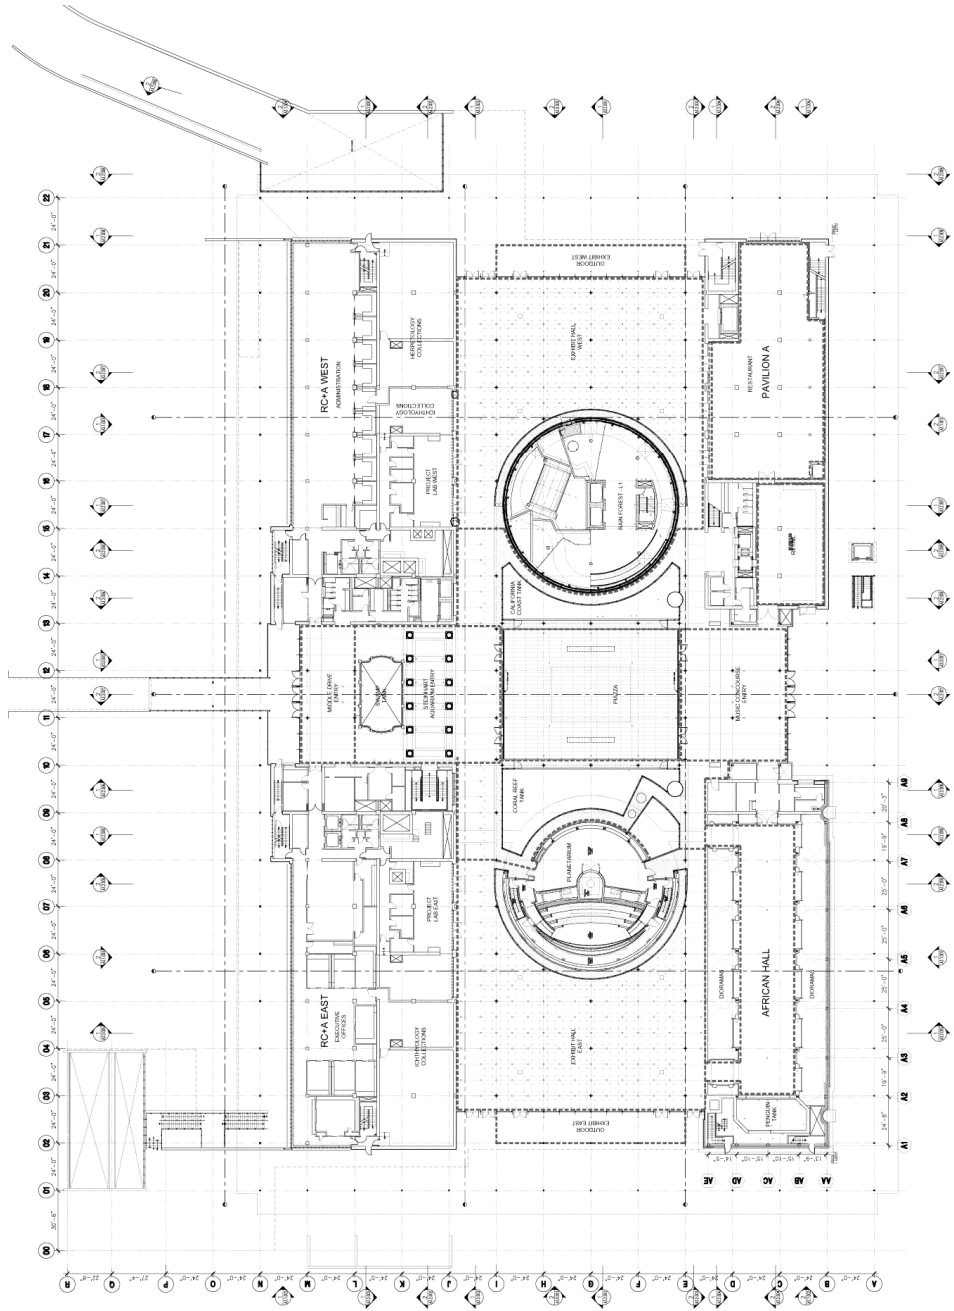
Ground Floor Plan, California Academy of Sciences
